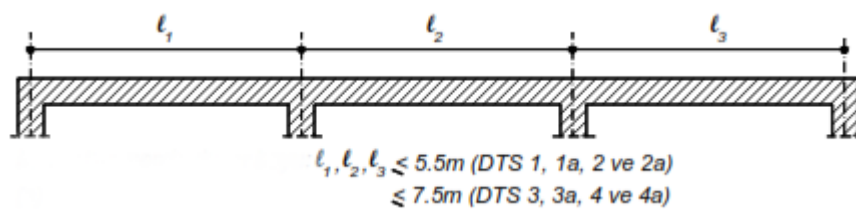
Unsupported Wall Length (Source: TER-2018)
